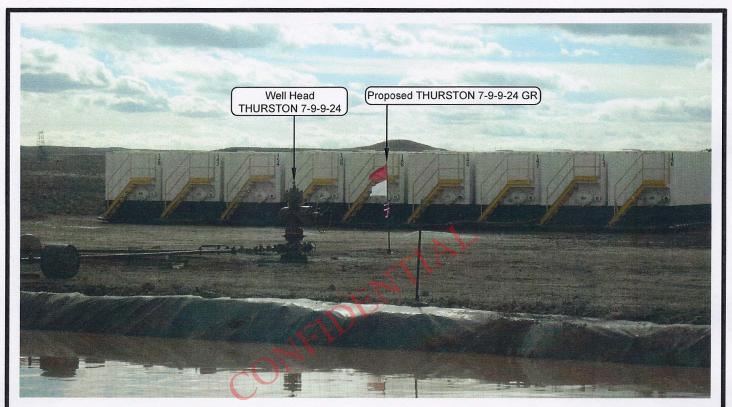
PHOTO VIEW: FROM PIT TO LOCATION STAKE
